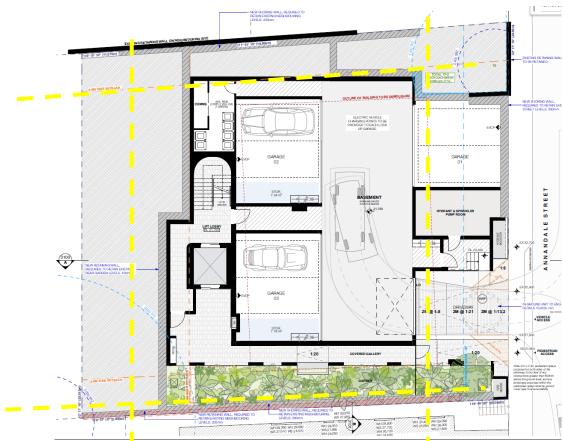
Basement level hoor plan, demonstrating the non-compliance rear setback and southern boundary side setback (Source: MHNDUNION)
